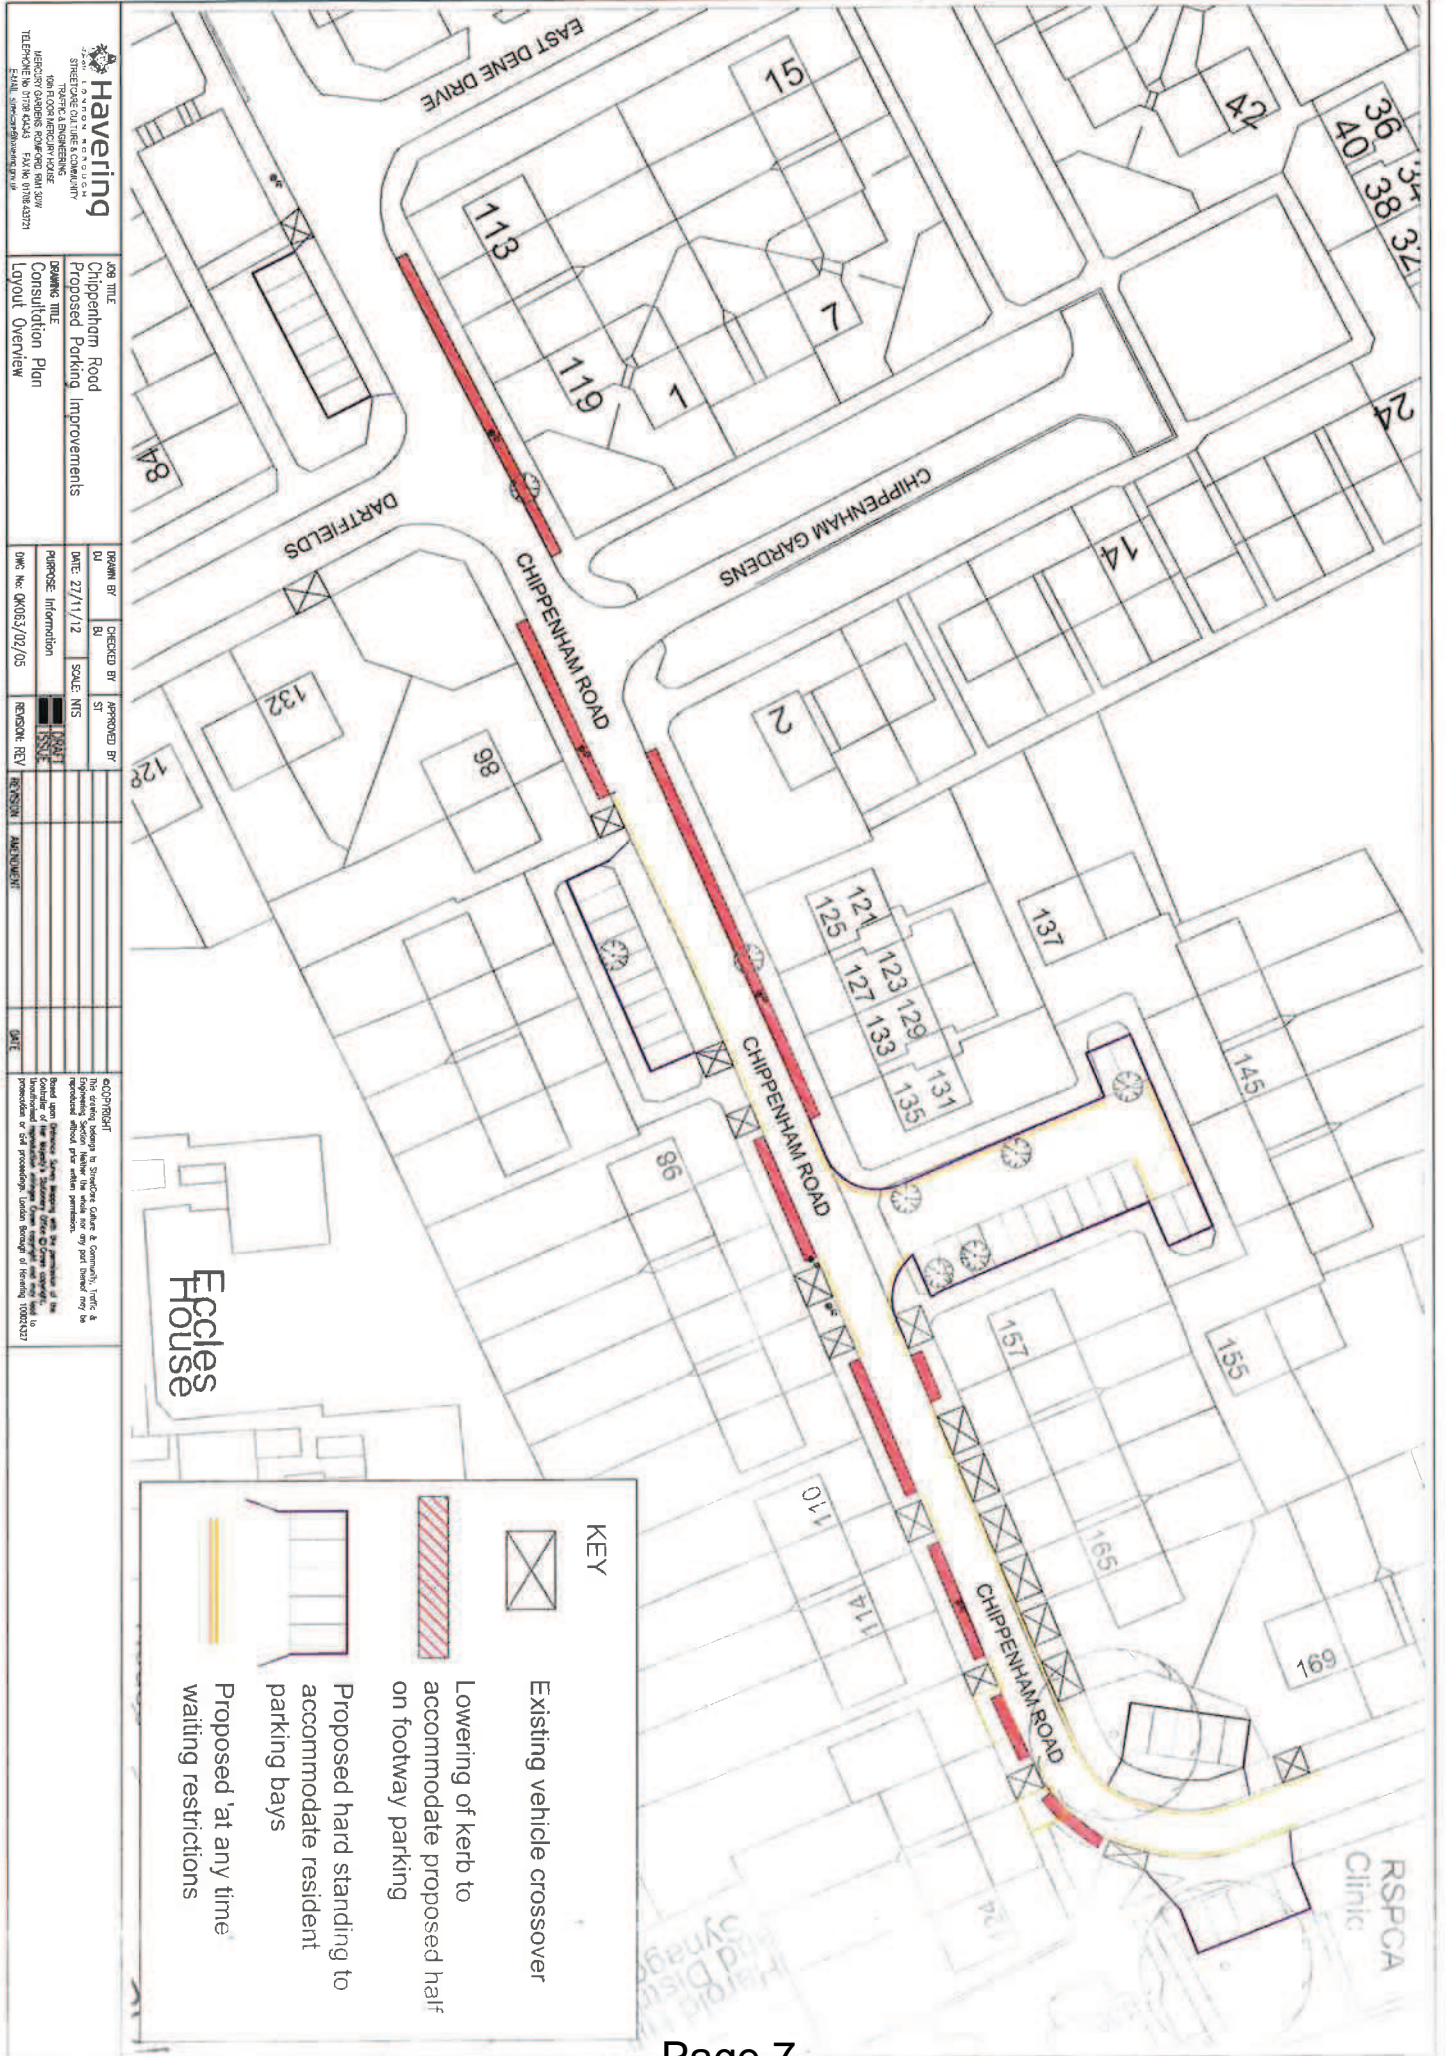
/02/05 – Chippenham Road Layout Overview
